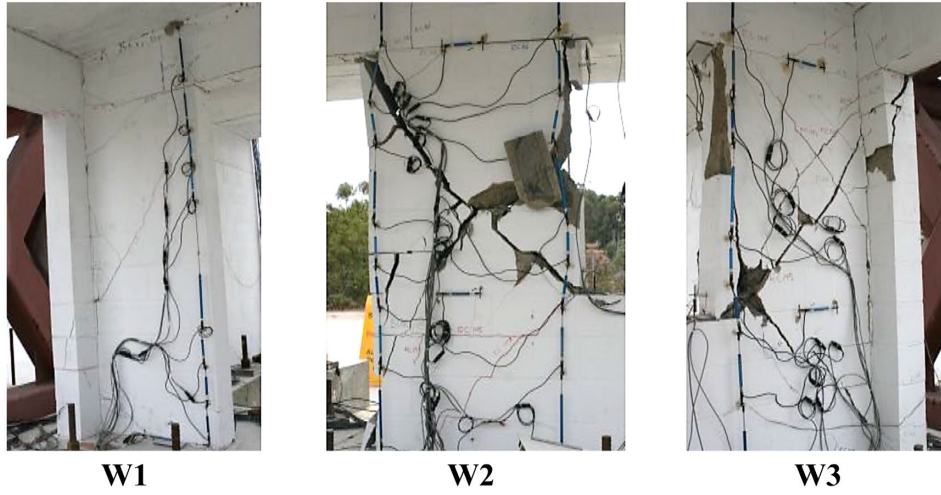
Damage patterns in the three wall piers at the end of the testing sequence (from Mavros et al. 2016).
